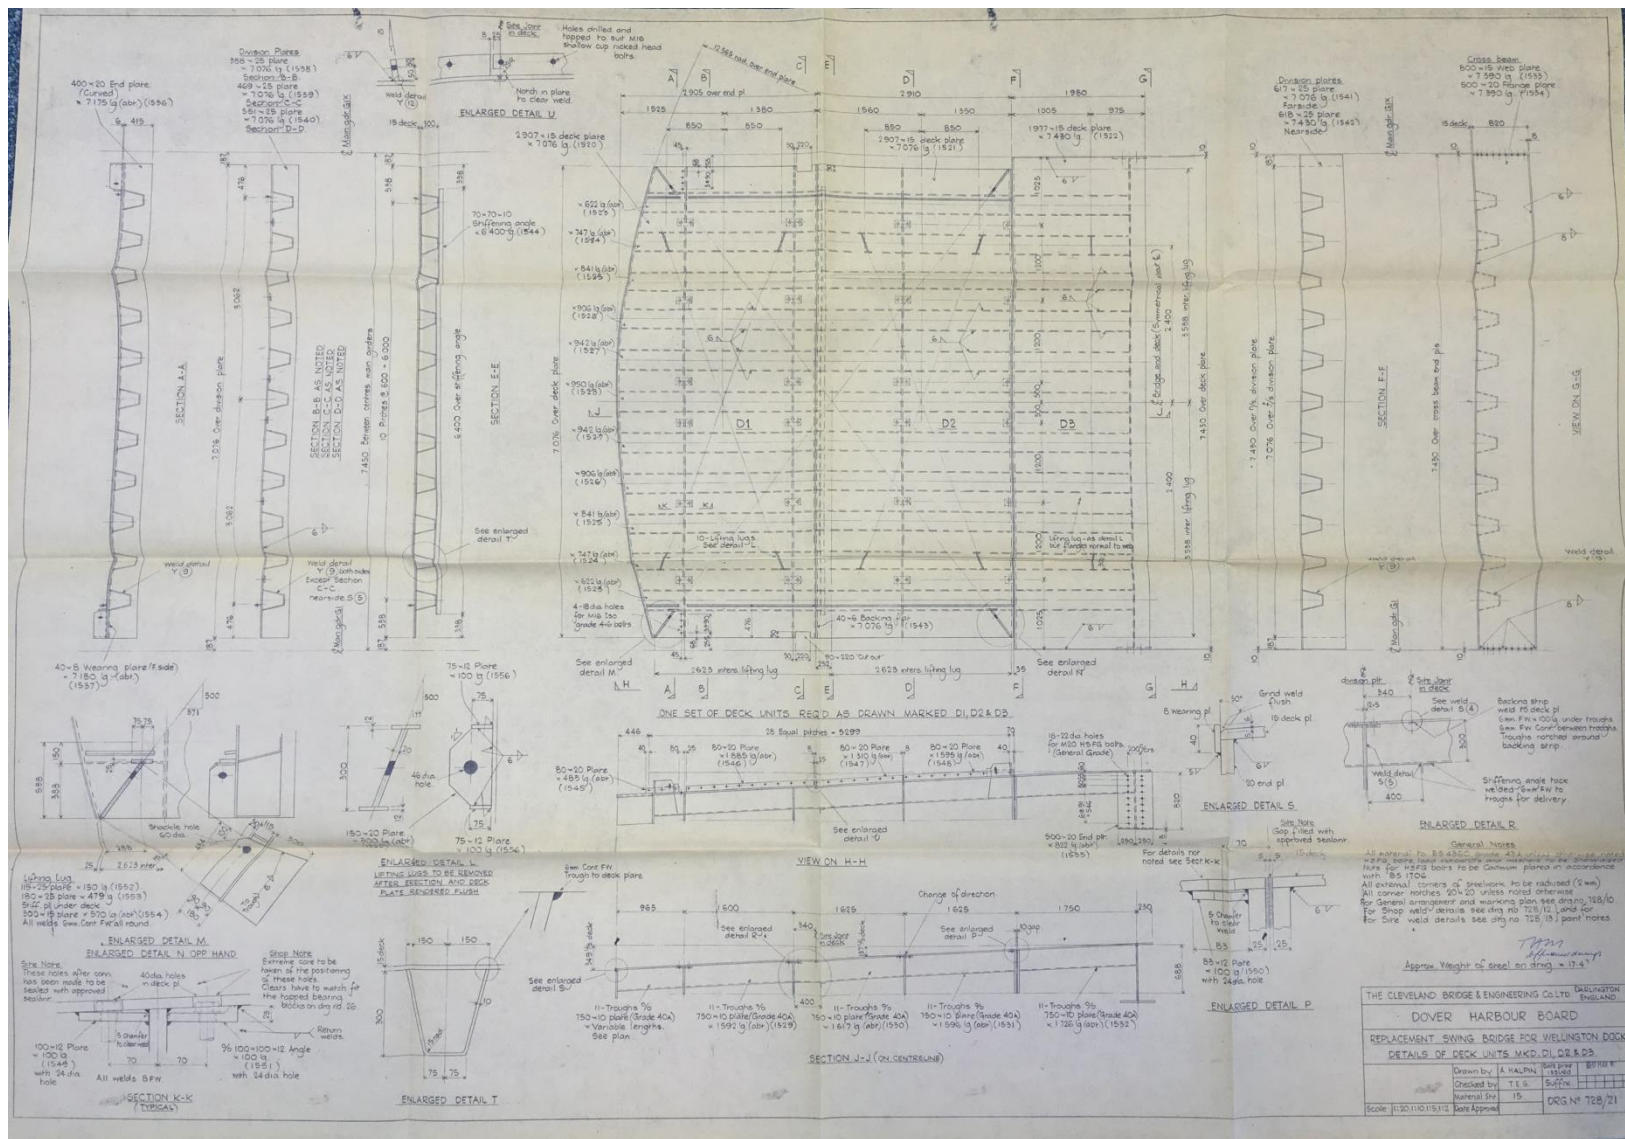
Replacement Swing Bridge for Wellington Dock, Details of Deck Units, Dated 29/03/1977, DHB Historical Drawing Archive, Drawing Ref: 728/21.
